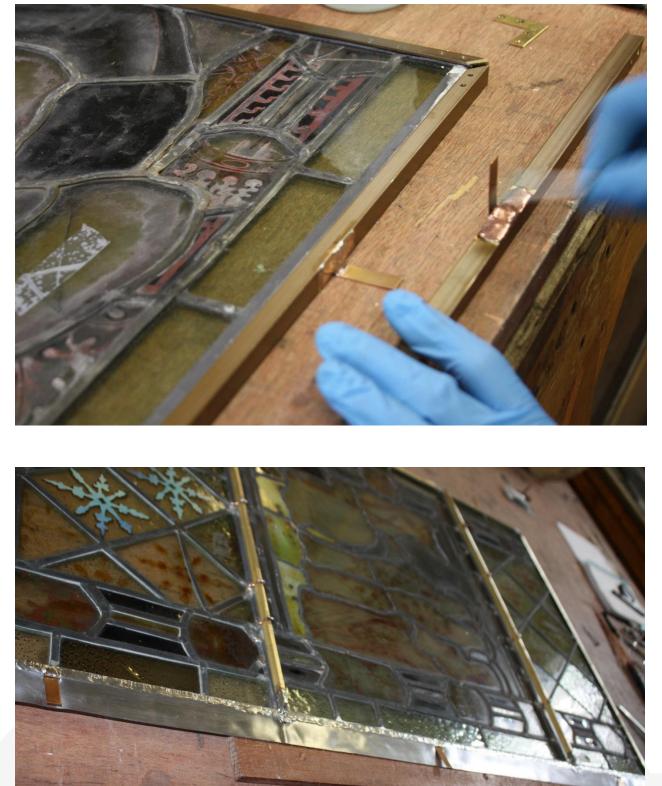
Details of the panels being housed in U channel frames with lead flashing soldered onto the edges.
